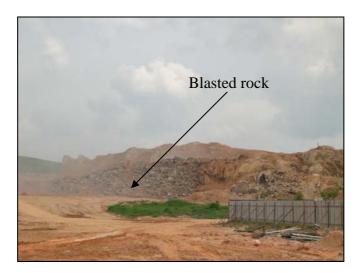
Blasting works is opted for excavation in granite (Location: Ulu Tiram). Traces of blasted rock can be seen at the bottom of rock face.
